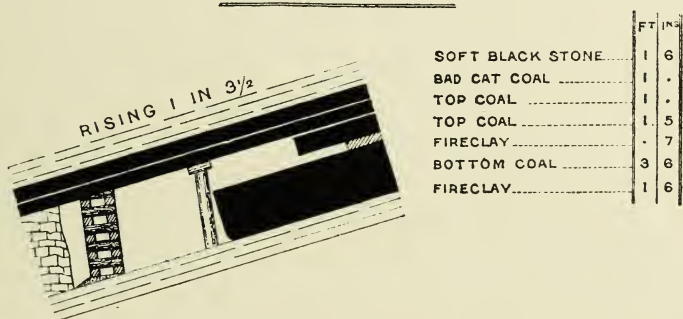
CLIFTON HALL COLLIERY, NEAR MANCHESTER. SECTION OF DOE COAL SEAM, AND TIMBERING IN IT.
